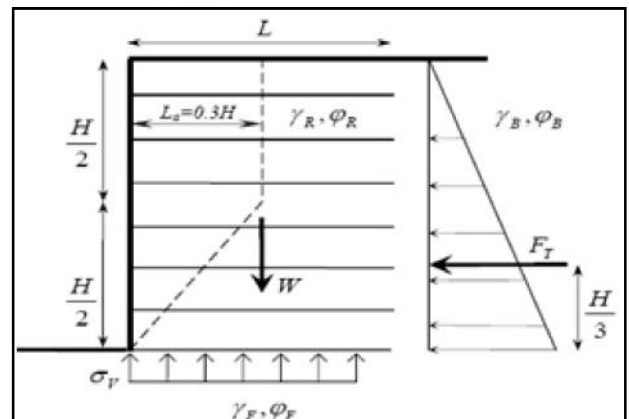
Reinforced Earth-Wall profile with surcharge load
